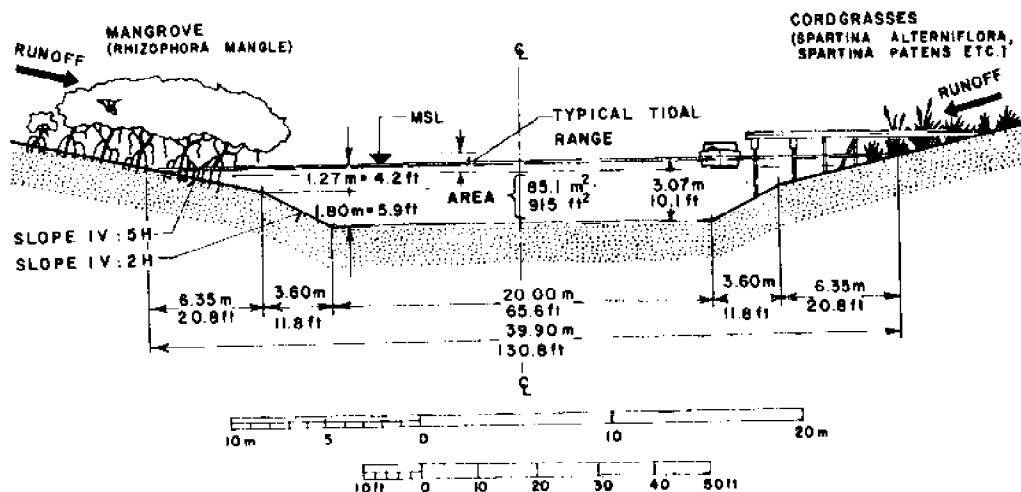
Vegetated Sloping Bank Trapezoidal Canal Section.
